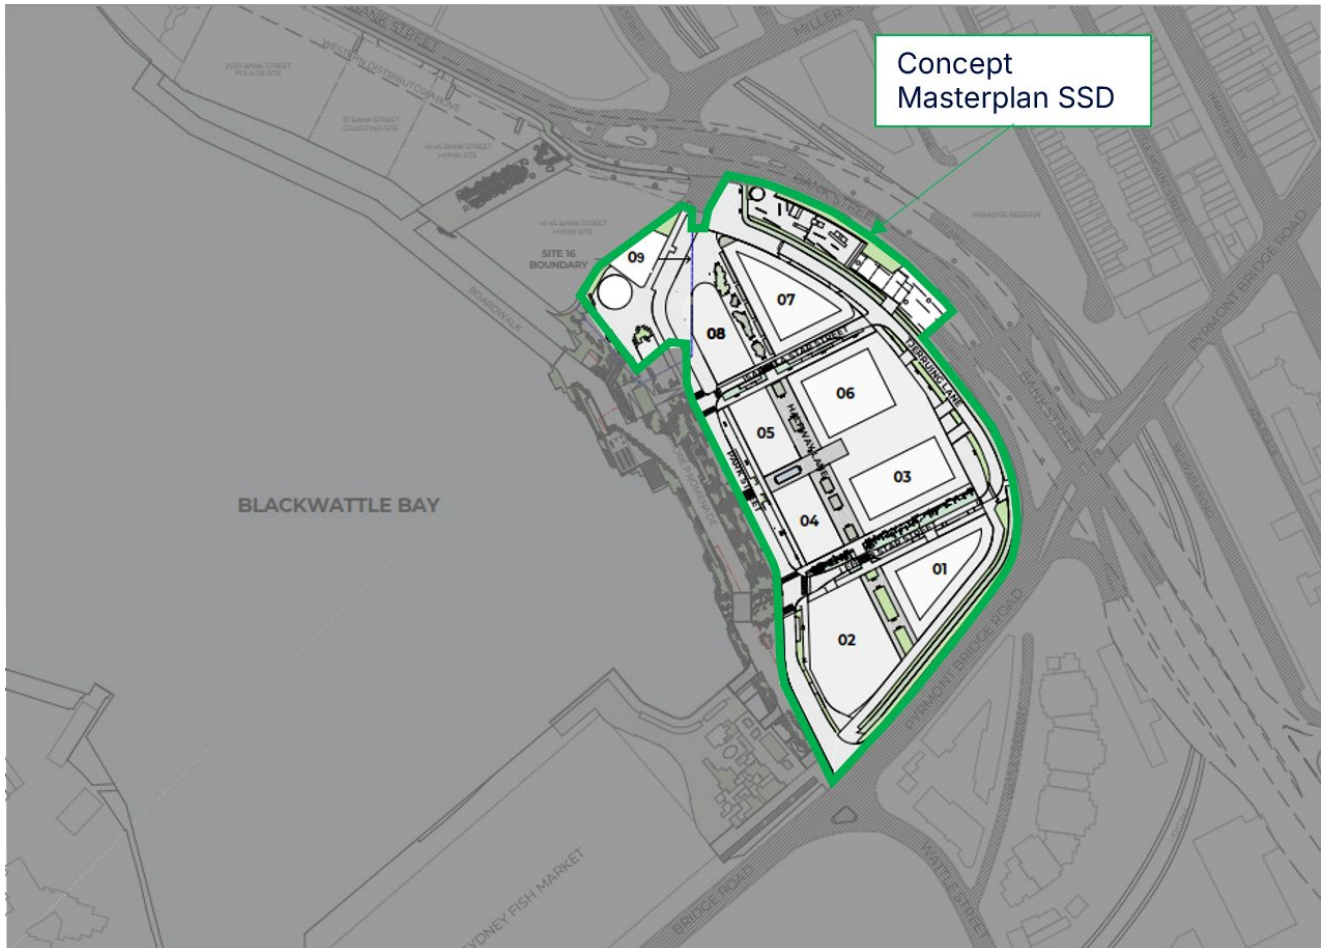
of the Design Guidelines comprises a Structure Plan. The proposed concept development and wider precinct plan is broadly in-keeping with the structure plan. Four tower buildings are proposed in the eastern part of the site with four other lower form buildings closer to the waterfront. Generous public open space including a promenade as well as a clearly defined street network that prioritises pedestrian movement and enhances permeability within the area is proposed.
